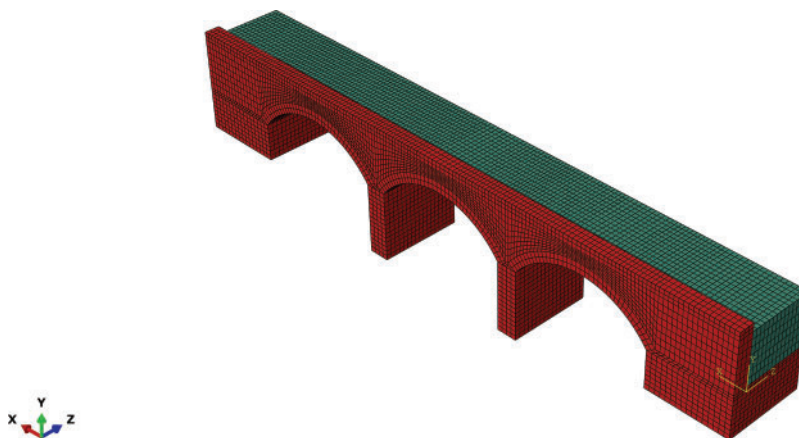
3D FEM modeling with a macroscale approach of a masonry arch bridge (half model) (adapted from Zizi et al.⁷⁷)
